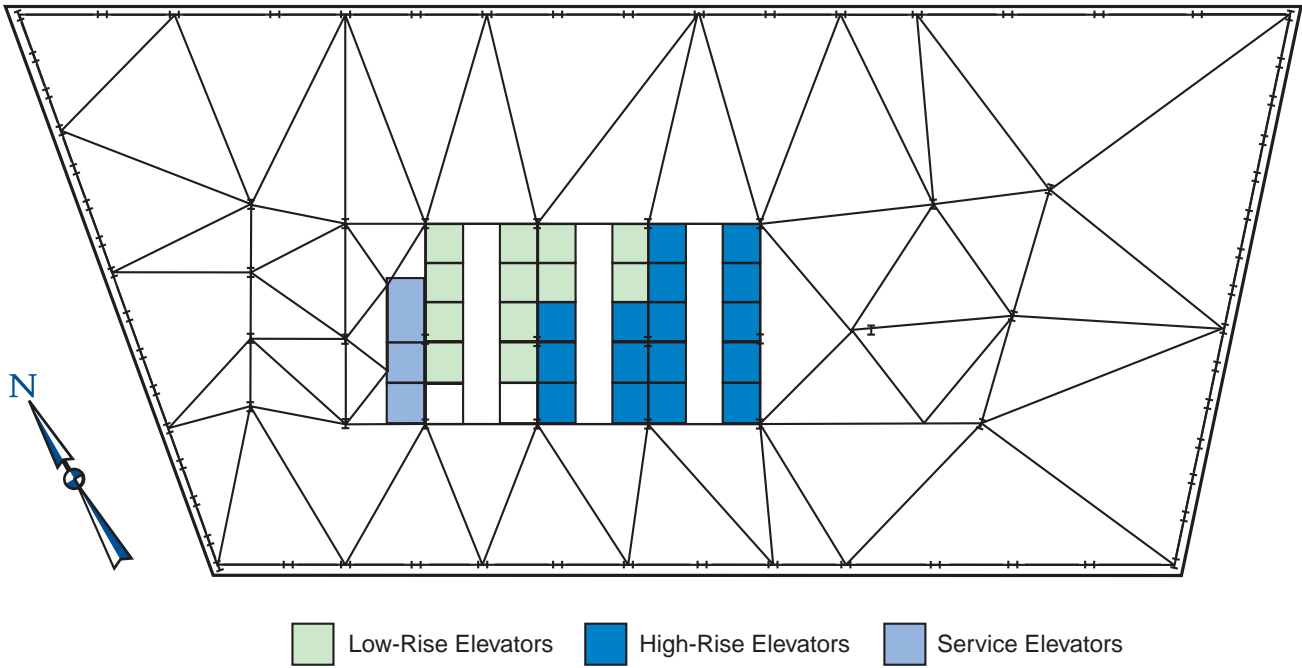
Fifth floor diaphragm plan showing T-sections embedded in 14-inch slab.
